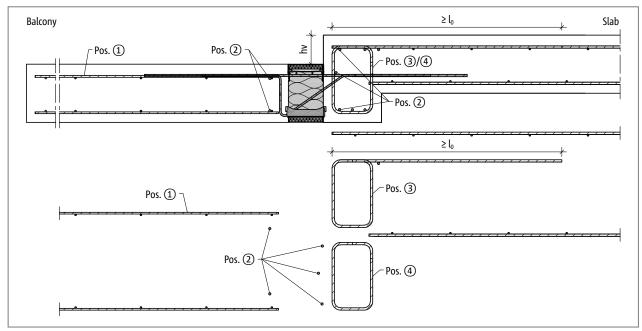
Schöck Isokorb® XT type K: On-site reinforcement for small height offset
